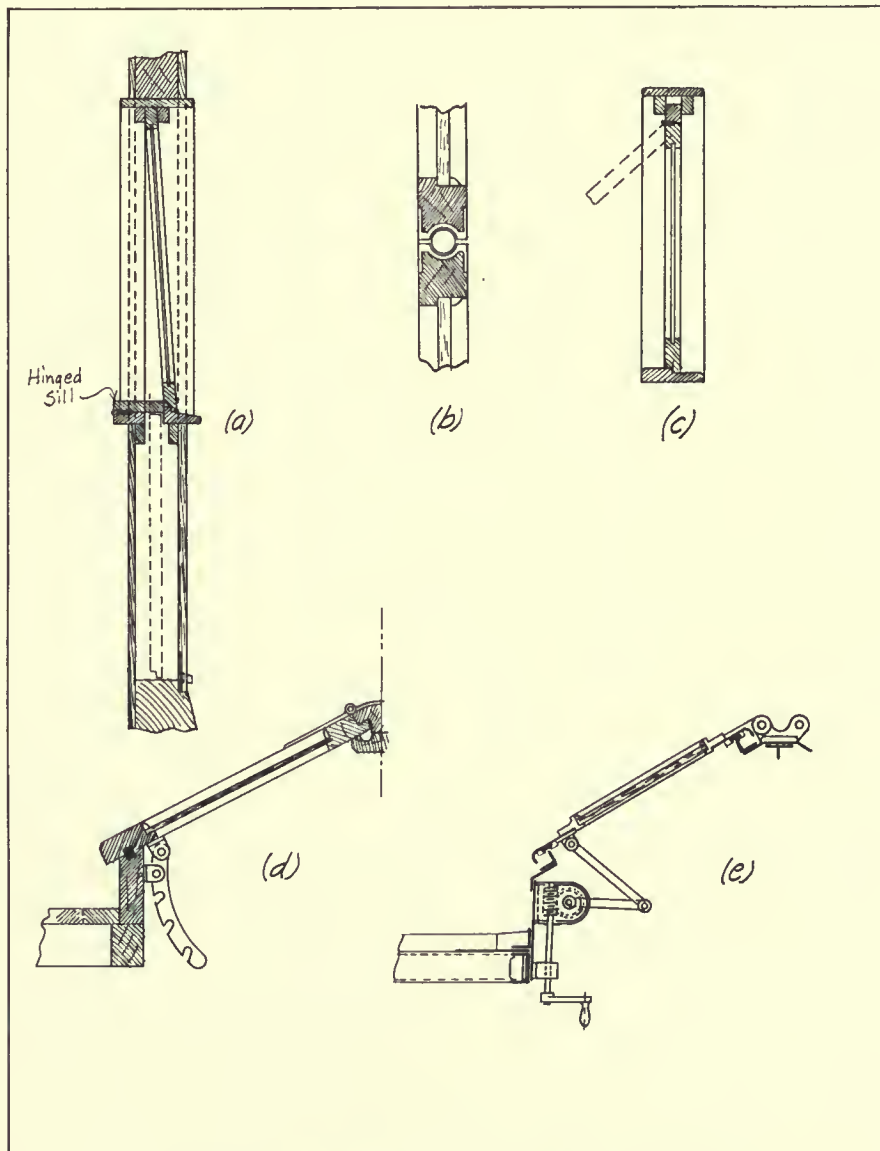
CONSTRUCTION OF HINGED WINDOWS AND SKYLIGHTS
